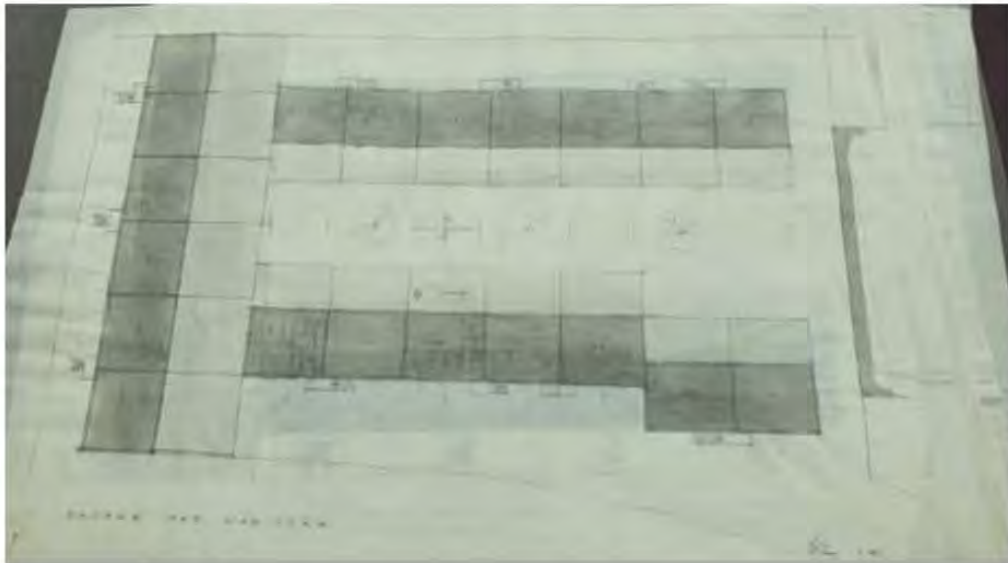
Floor plan for proposed carpark with above residences at Double Bay, Cross Street (Source: State Library of NSW, PXD 351, Roll No.120, ff1216)
